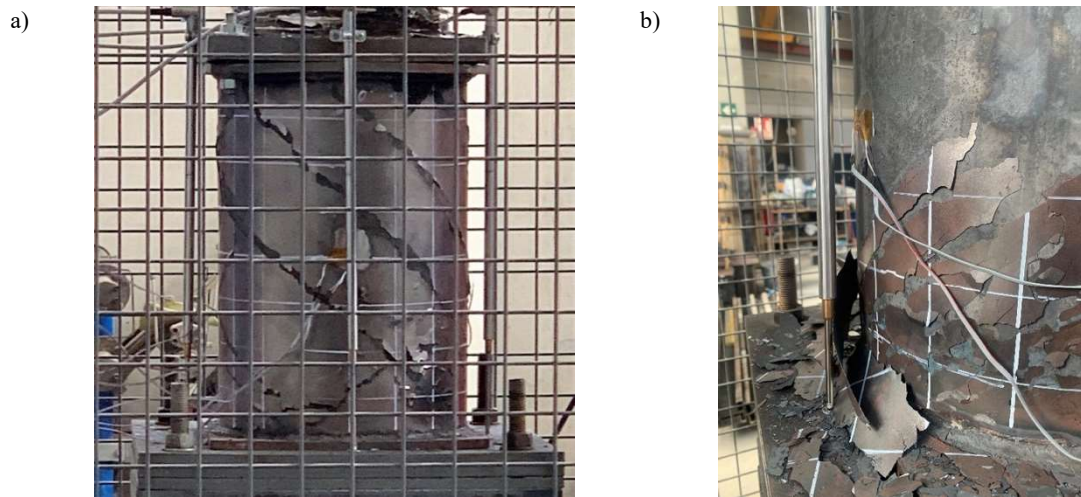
Shear slippage lines in the mechanical tests: a) SR-CFST-C-T1 during the test; b) SR-CFST-C-T2 bottom end detail after the test.
